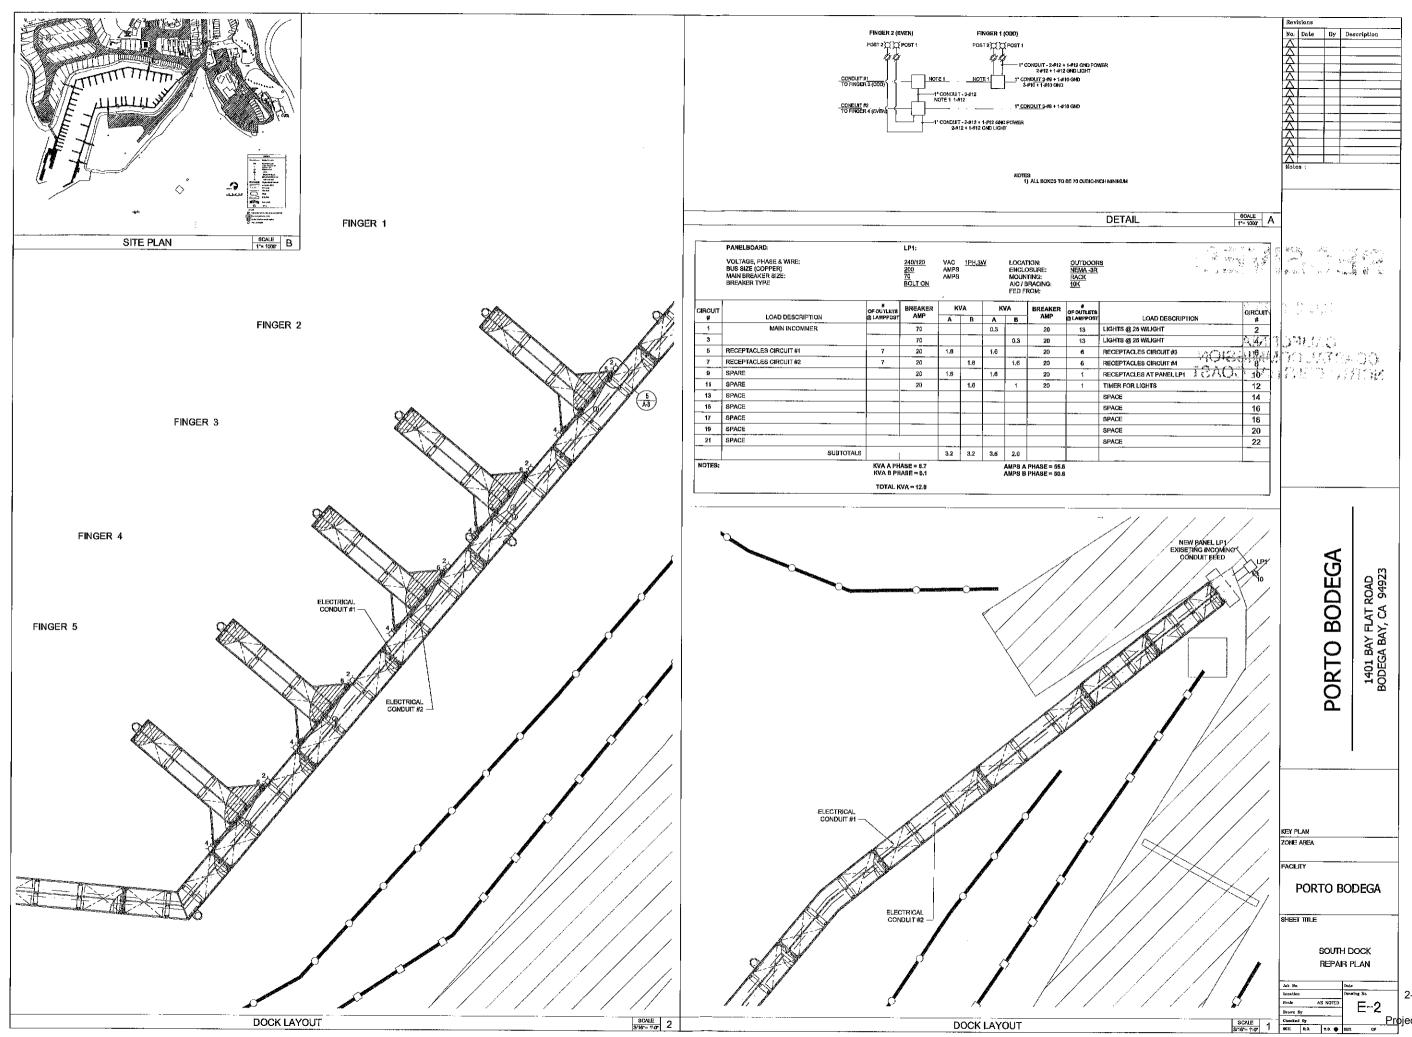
2-08-013 & 2-10-030 (Porto Bodega LP) Project plans and photos Page 9 of 14
